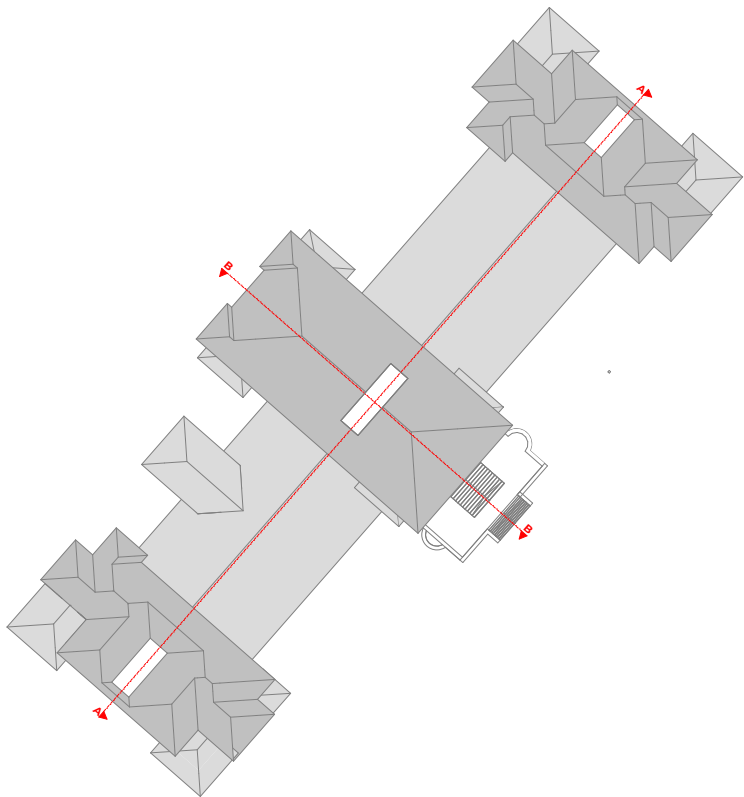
Roofplan Scale 1:1000 (Source: Created by the author, 2024)
